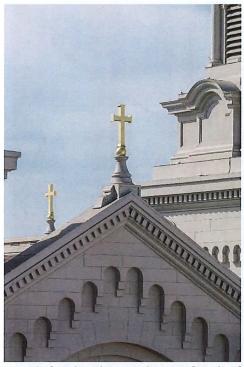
Cornice above main entry façade after restoration. (Rich Stapleton, 05/21/2018
